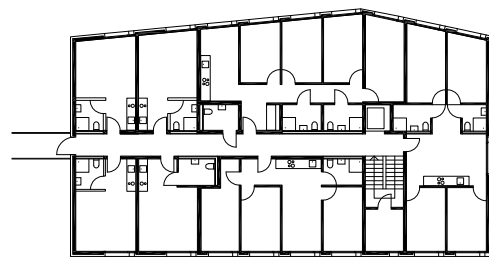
Floor plan standard floor, M.1: 500 [© BF Vario]
